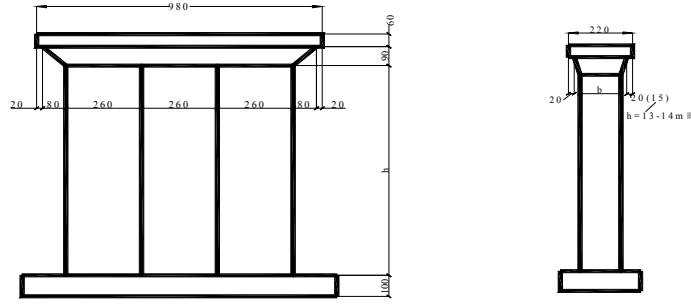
Cross section of typical pier in longitudinal and transversal direction
